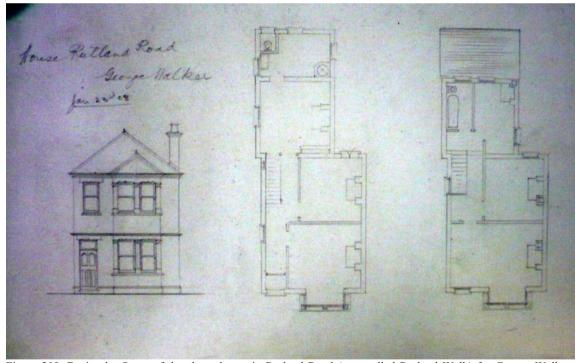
Design by Stone of the above house in Rutland Road (now called Rutland Walk) for George Walker, 1908 (Prior collection, Item 1565)
